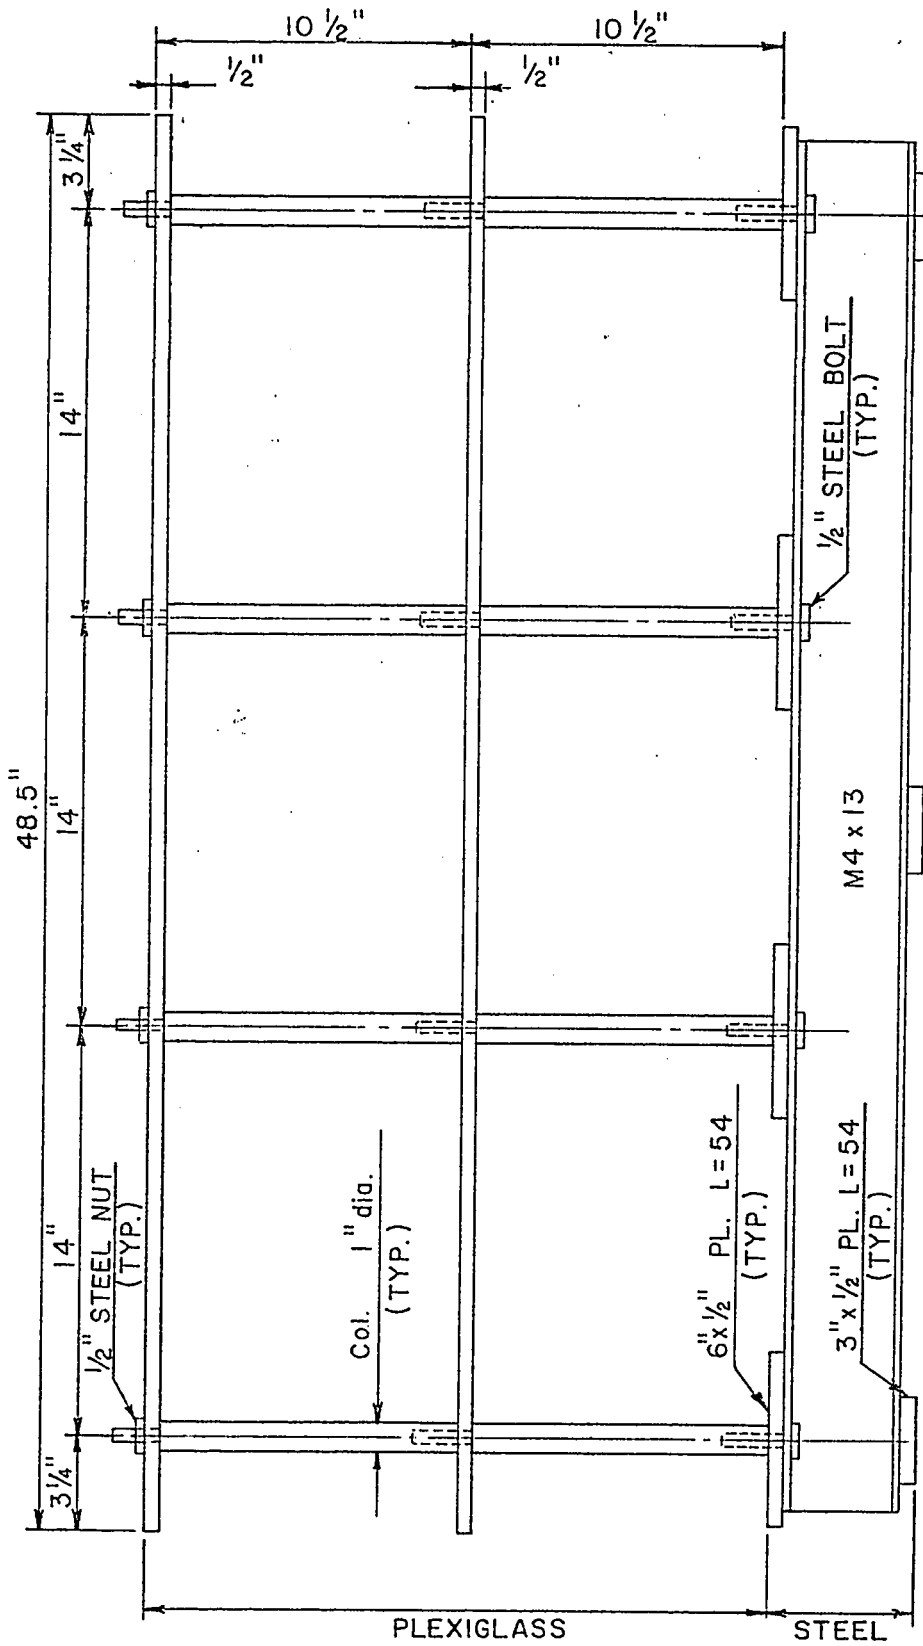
ELEVATION OF TEST STRUCTURE
